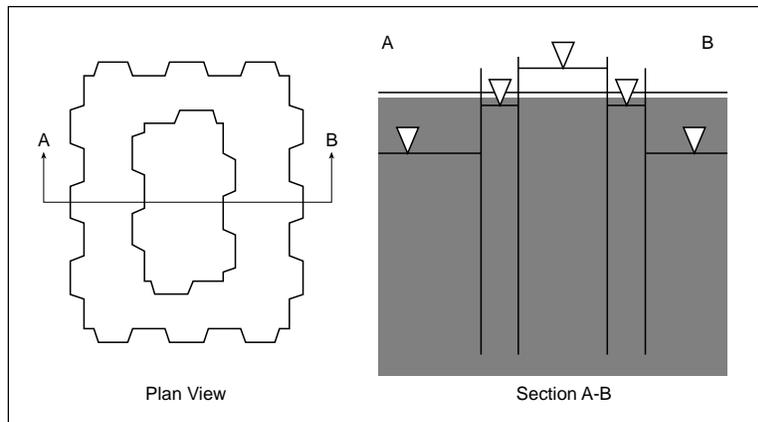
Plan and cross section of Waterloo barrier test cell for hydraulic conductivity (Smyth, et al., 1995)
